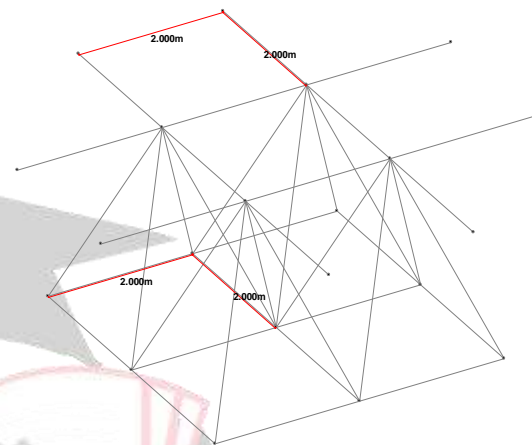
A Part View of Space Frame Joining Top and Bottom Grid Members.
